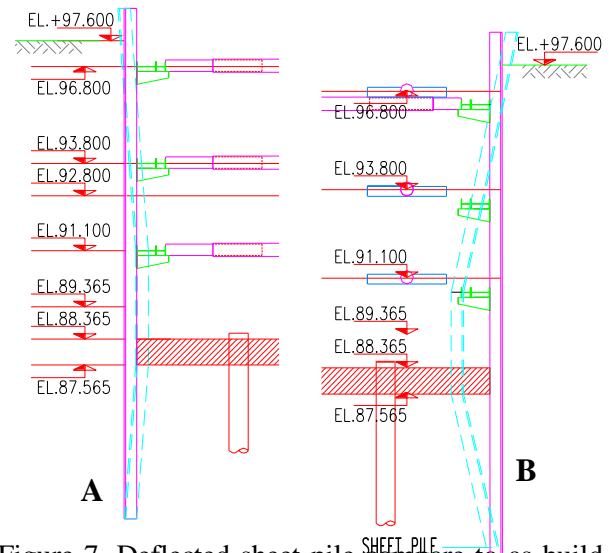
Deflected sheet pile compare to as build drawing A) on South site near SW-2, B) on West site near SW-1
